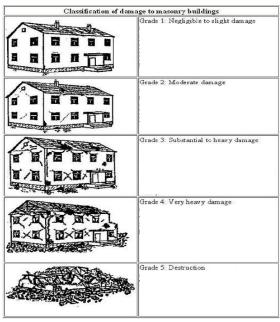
Damage distribution for masonry buildings after EMS-98 scale [25]
